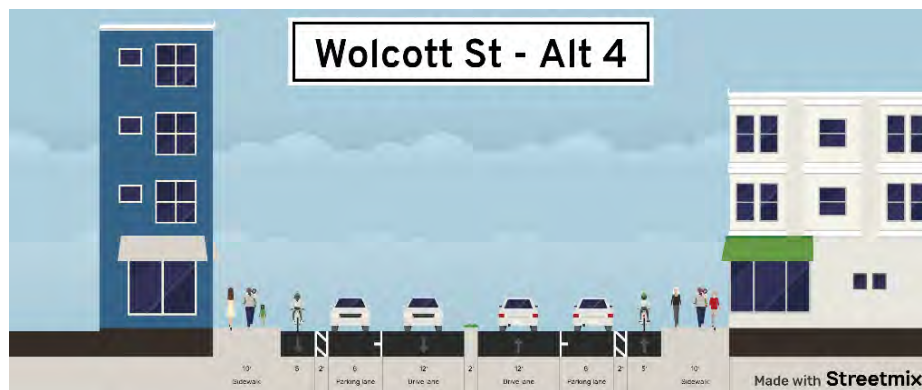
WOLCOTT ST ALTERNATIVE 4 PROPOSED CROSS SECTION
